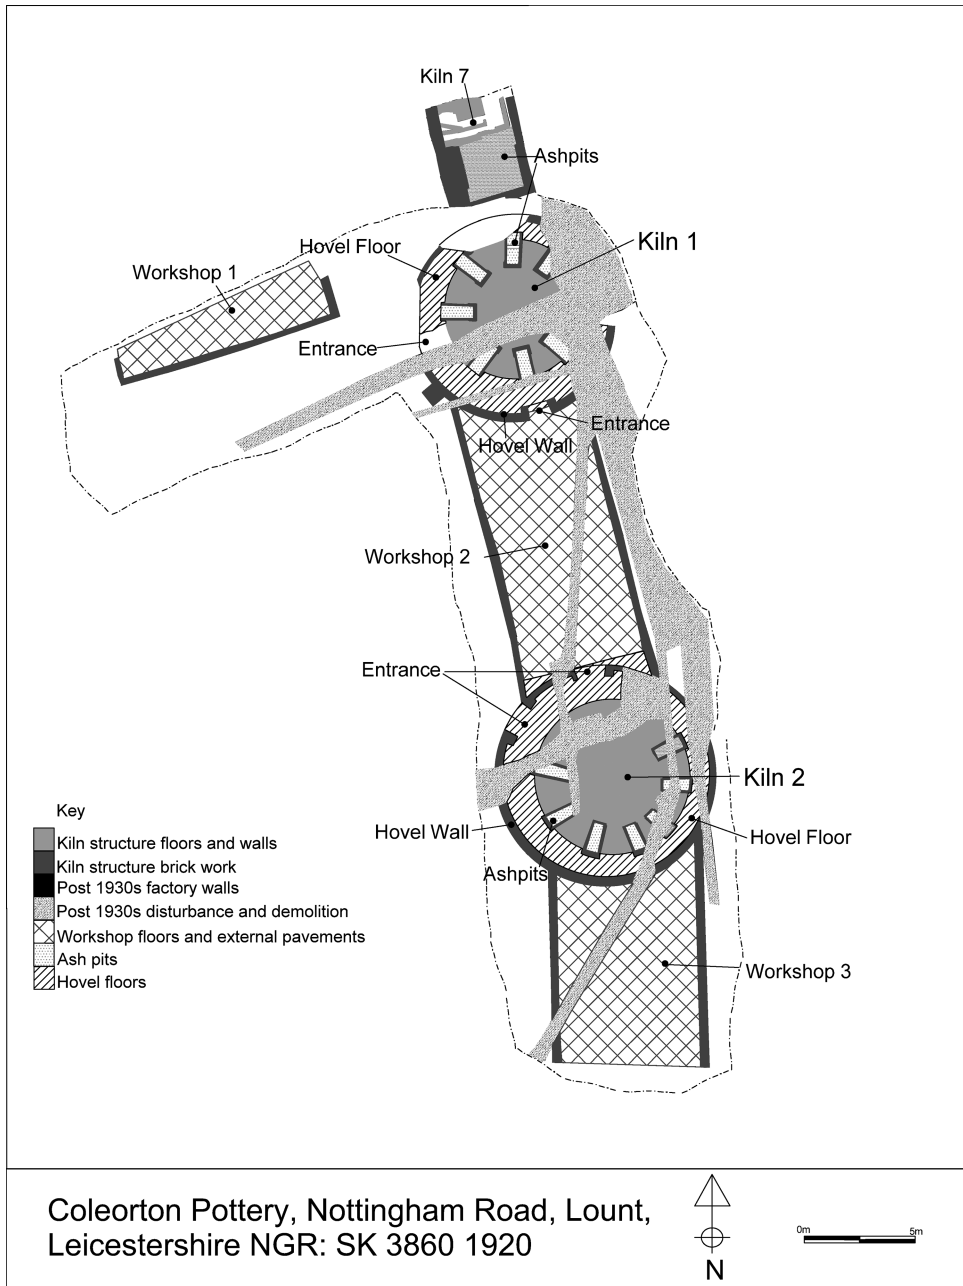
Plan of Kilns 1-2 and Workshops 1-3.
